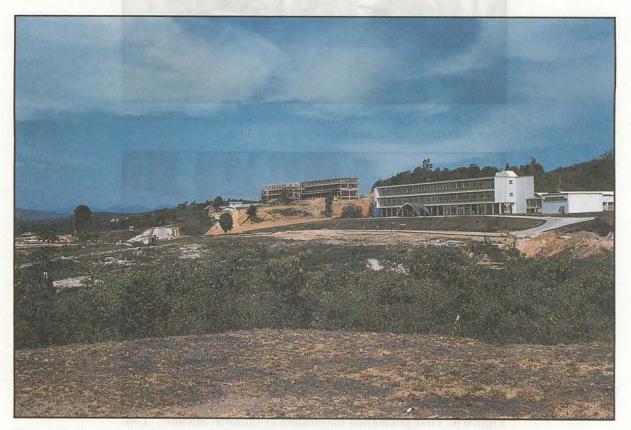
Engineering Faculty built, Second Residential College under construction, no lake (Mason's Folly) yet.
